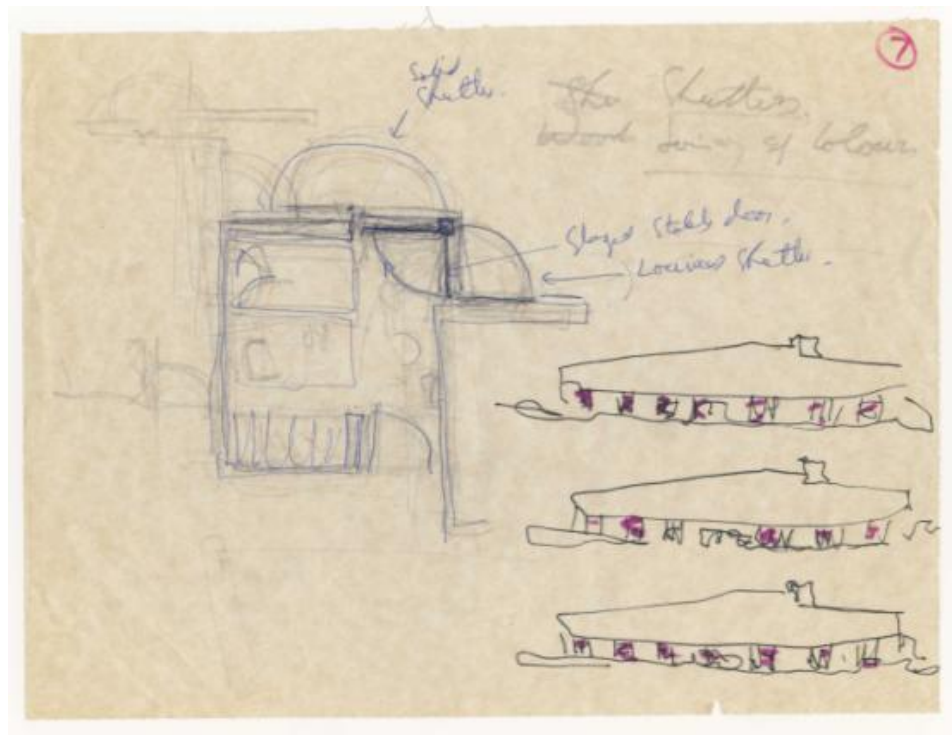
Bedroom plan exploration and colour study (Fagan archive - Job No. 8011, undated).
